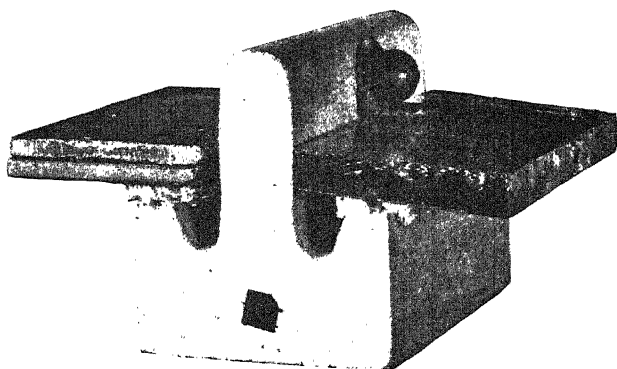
PLATE I. SEGMENT OF A REINFORCED BEAM OF RECONSTRUCTED STONE.
